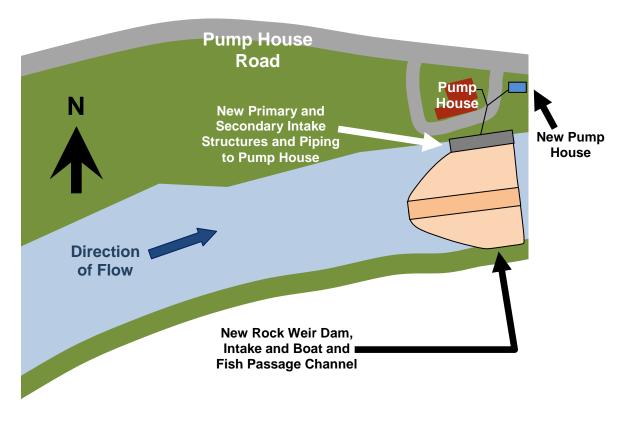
Illustration of Alternative 3: New Rock Weir Dam and Intake with New Pump House
